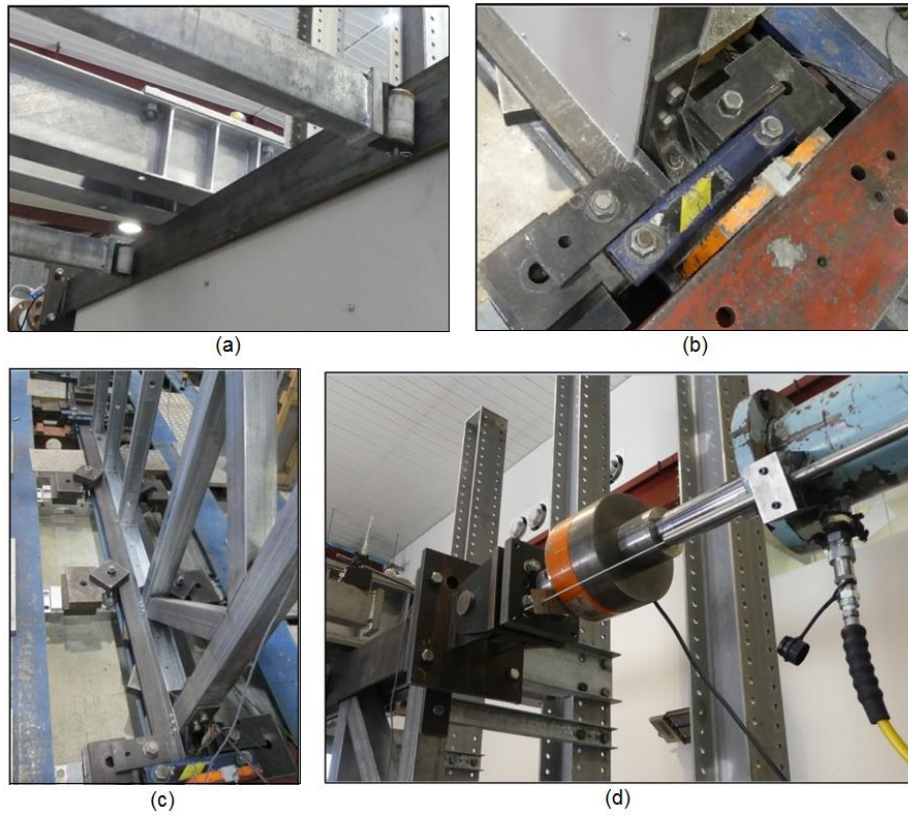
Experimental setup: a) Lateral Support b) End of wall restraint c) Restraining of bottom beam d) Connection of actuator to the wall
